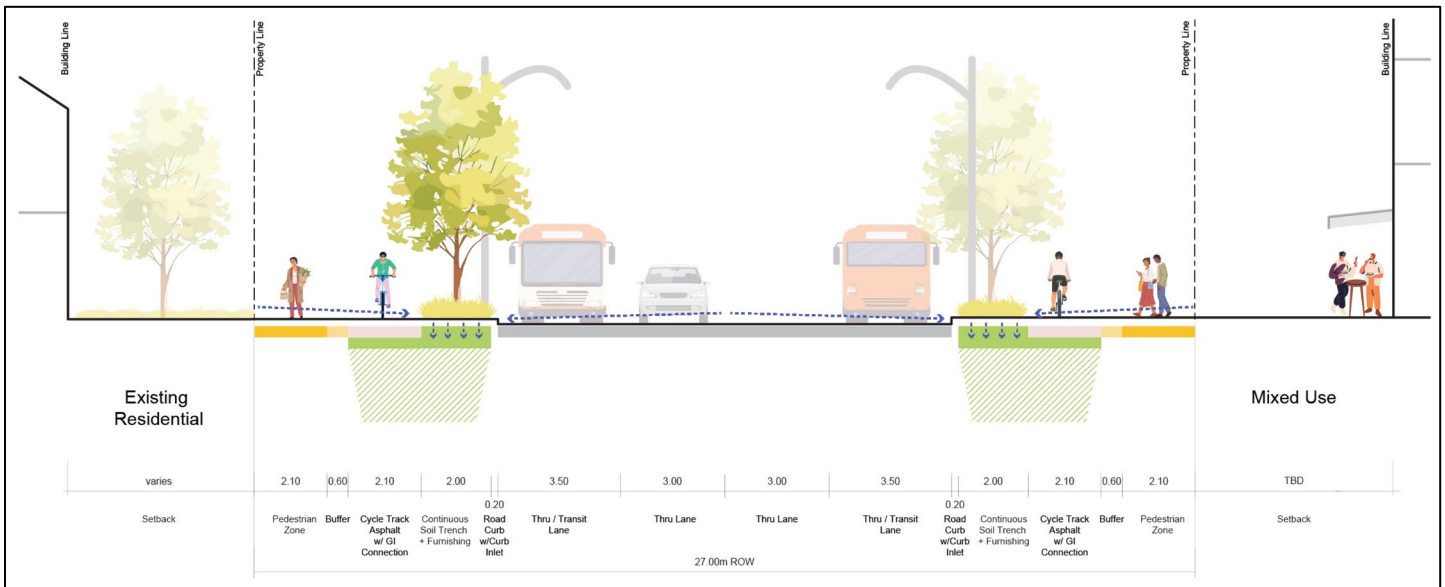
Existing Dufferin Street (Wilson Avenue to Beffort Road) Cross-Section - Option 5
